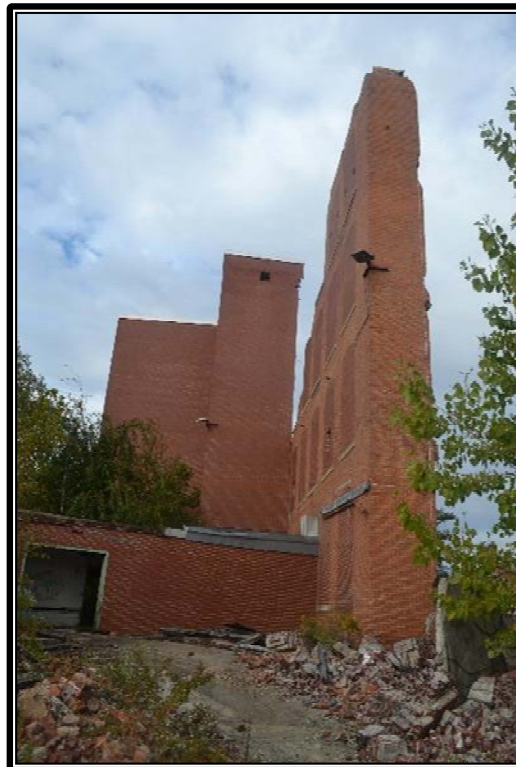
Unsupported brick masonry on north elevation of elevator tower.
